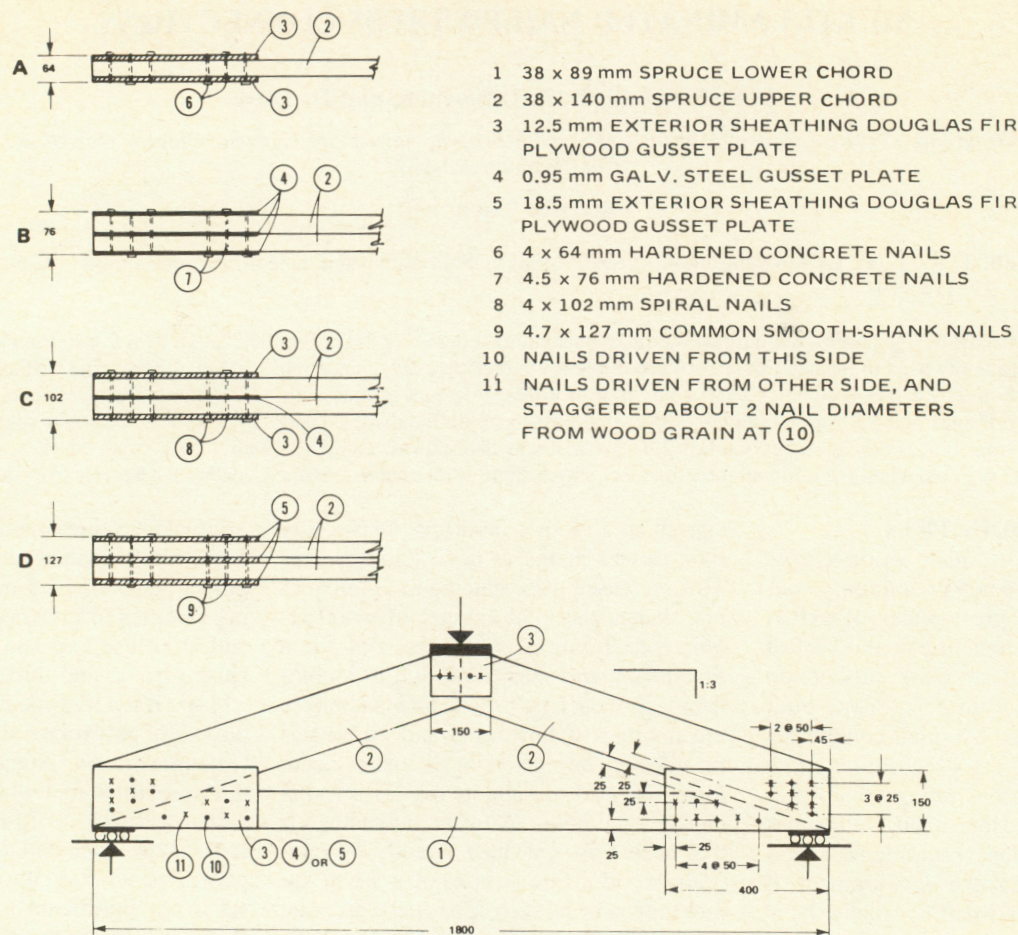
Details of test specimens to compare four types of multiple-shear nailed connections. Plan views A through D give details of four different treatments compared.
